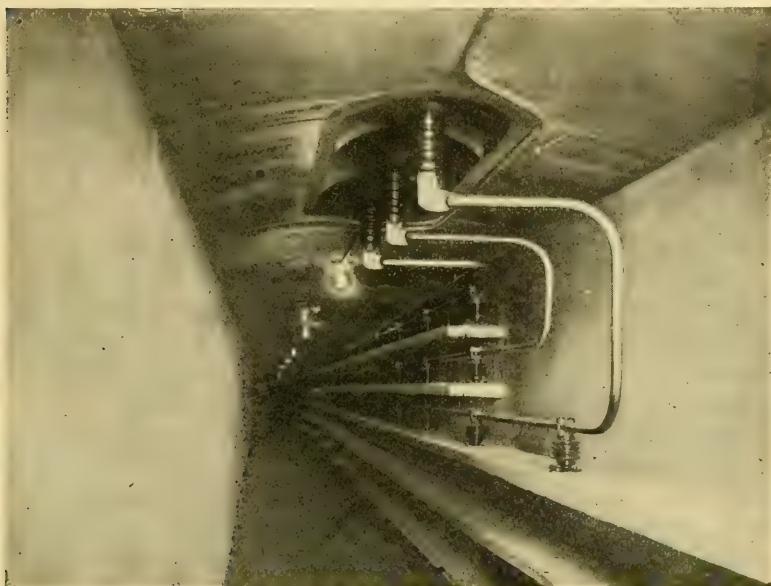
Showing Method of Bringing Low-tension Leads from Outdoor Transformers to Building through a Tunnel.
